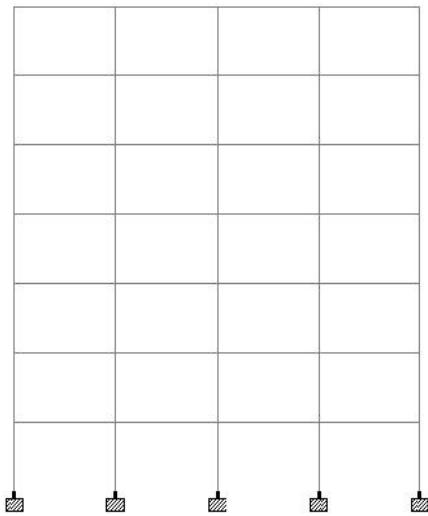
elevation of view of building Without soft story in STAAD.Pro
